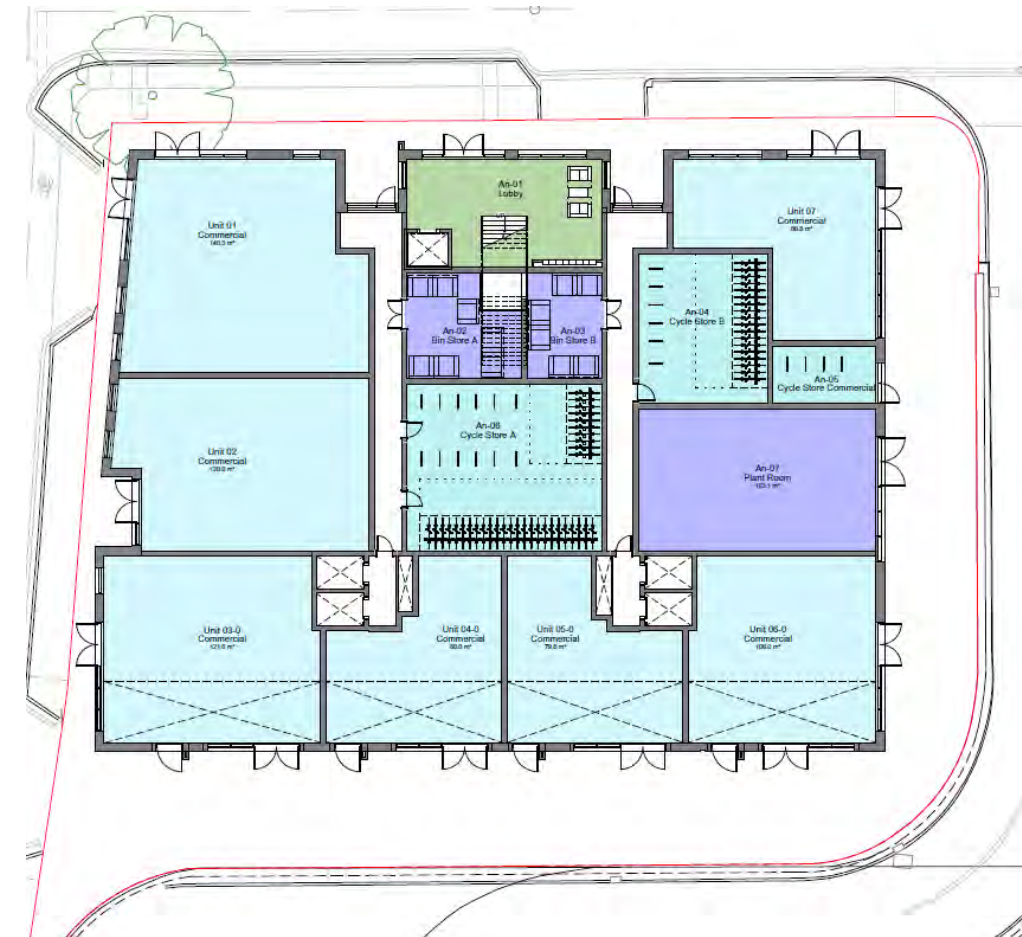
Proposed Ground Floor of Caxton Road Site
